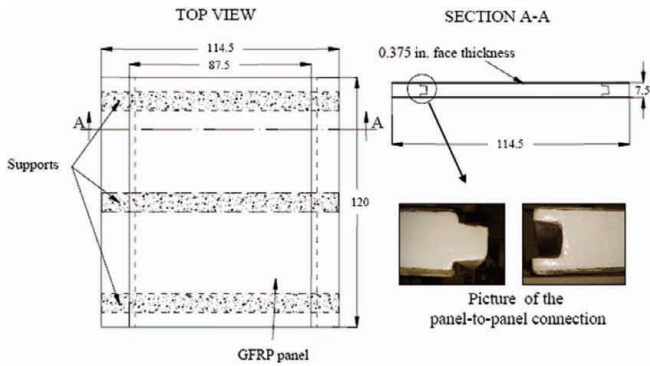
Plan View of Test Set-up for O'Fallon Park Bridge (Camata and Shing, 2004)
